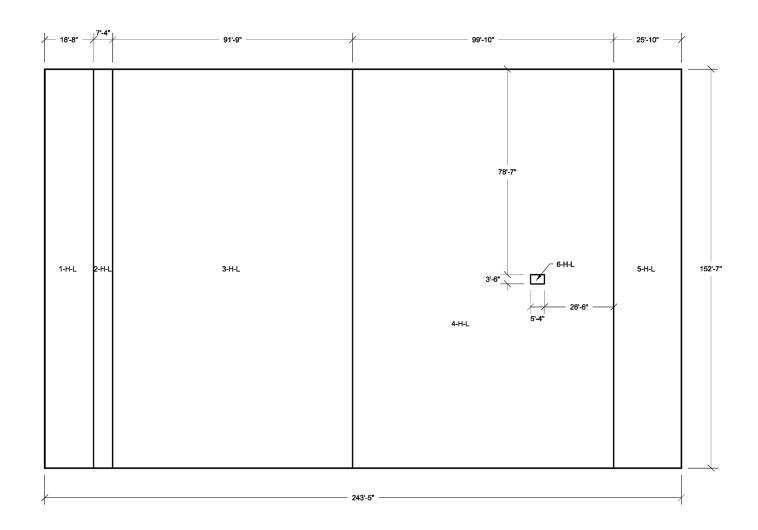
H.3-30 Basemat Looking Down East-West Reinforcement Zones Far Side Face
